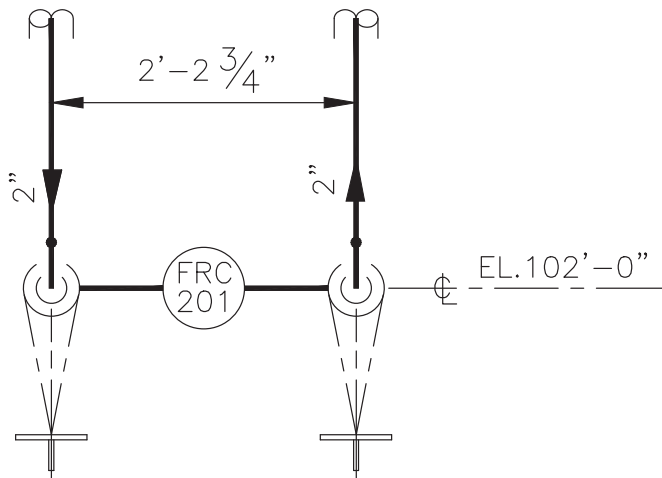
Control valve manifold on Piping Arrangement drawing.
